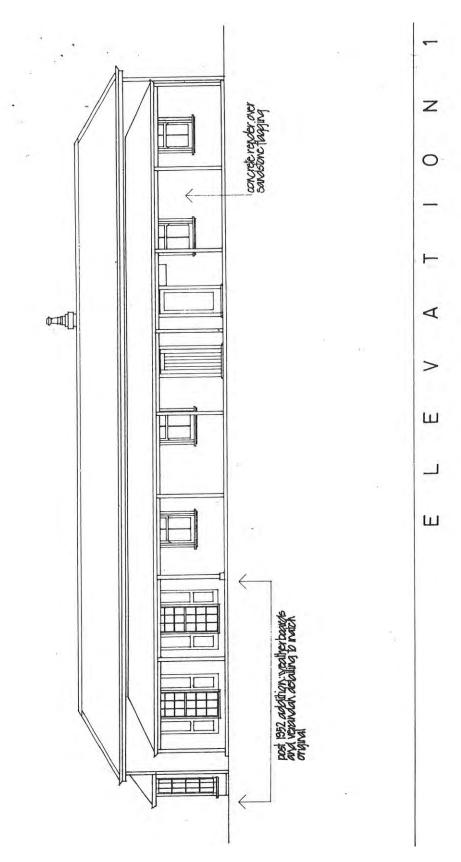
Southern (primary) elevation of Constable's Cottage, showing changes to the fabric. (Source: Gojak, D, c1985, Site Notes on South Head, courtesy of National Parks and Wildlife Service)
